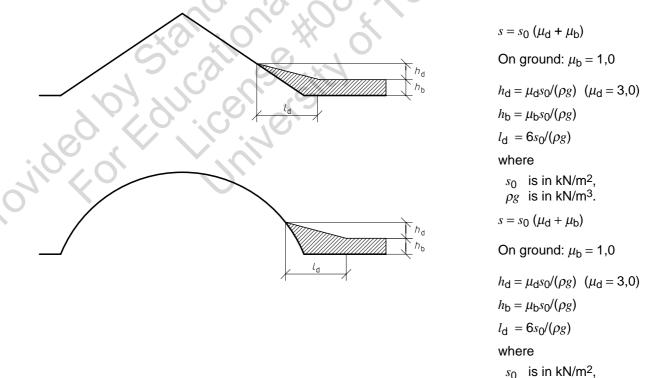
Additional drift load and sliding load acting on upper arch or pitched roof
